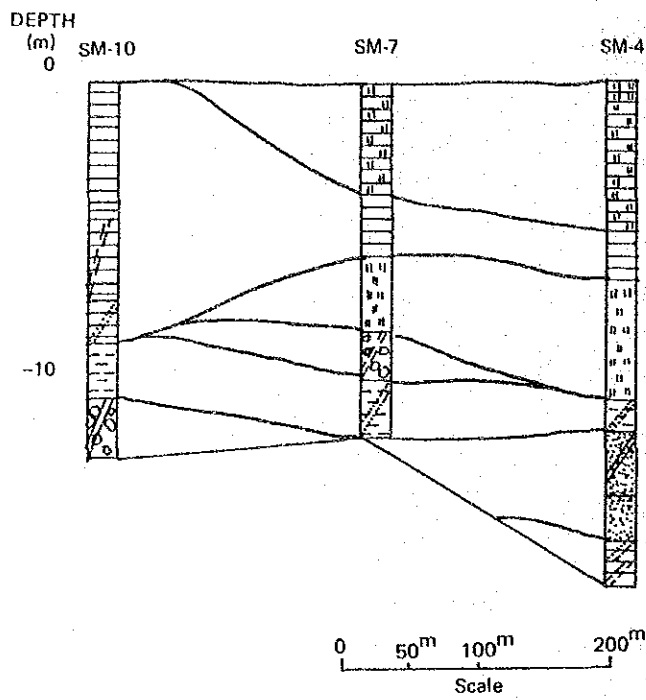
Soil Profile, Section ⑪ - ⑪
